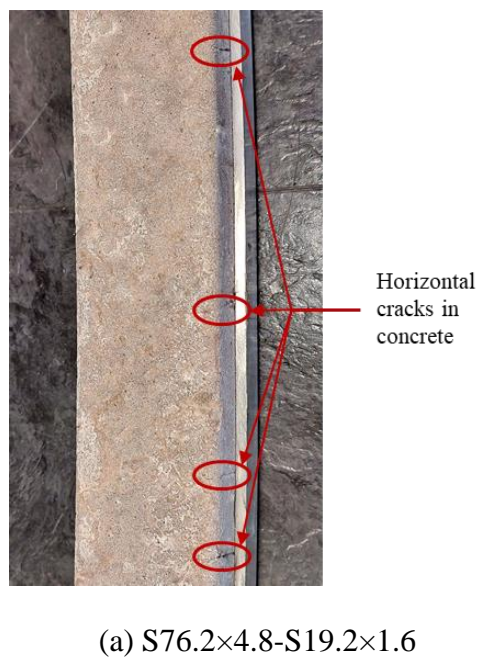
Horizontal cracks in the concrete infill of a typical CFDSAT specimen.
